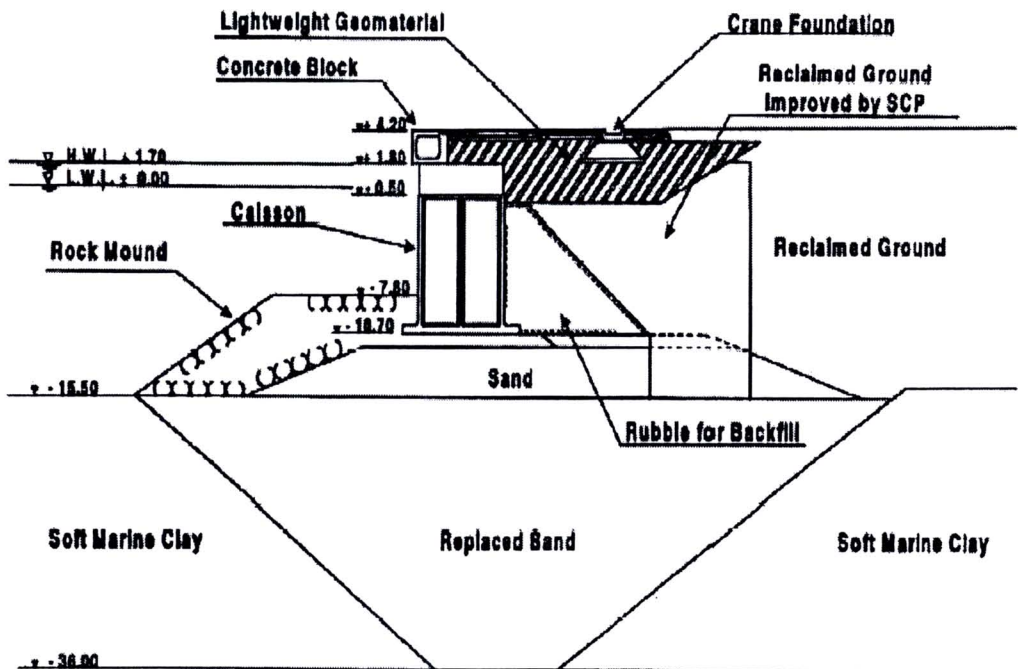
Cross section of reconstructed seawall using engineered geo-material (Porbaha and Yamane, 2004)
